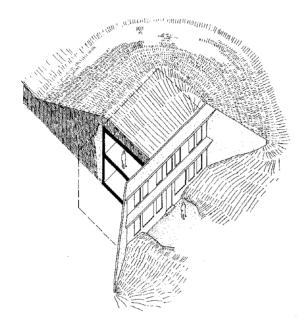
Type D-4 Two-Story Single Window-Wall Dwelling
